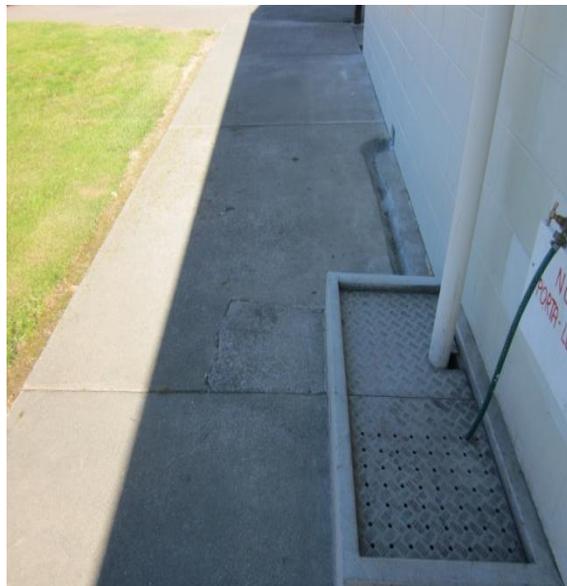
The external concrete path on the east side of the building showing typical differential settlement
